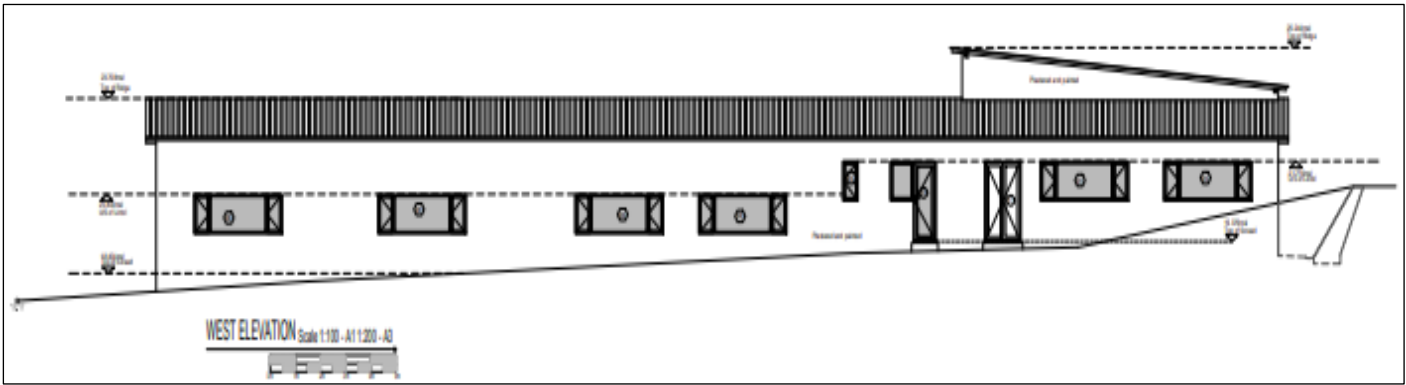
West elevation of the proposed new garages (TMBA, 2023)
